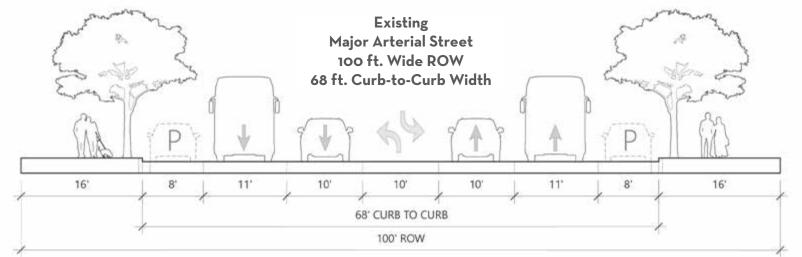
Existing: Typical Major Arterial Street with a 100 ft. wide ROW and 68 ft. wide curb-to-curb.
